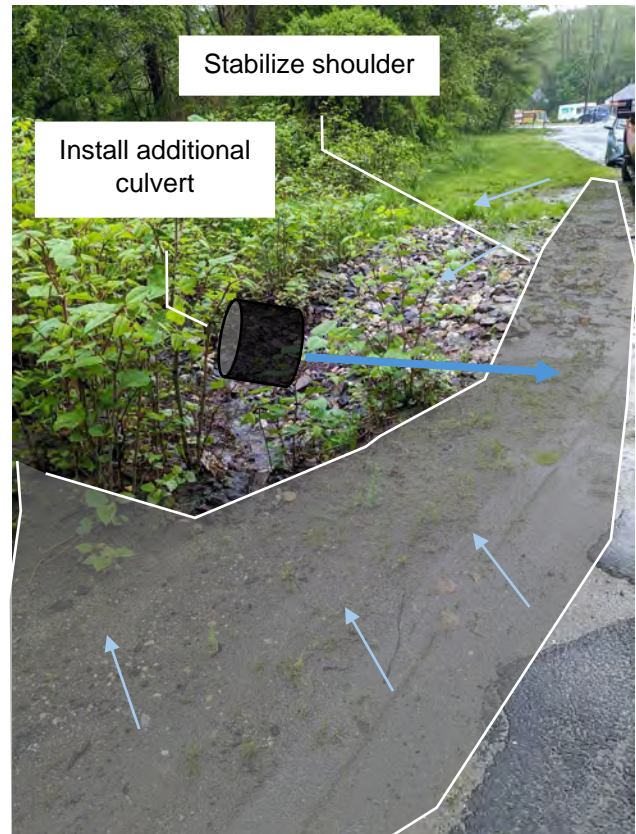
B-2: Culvert inlet and erosion along shoulder of River Road
